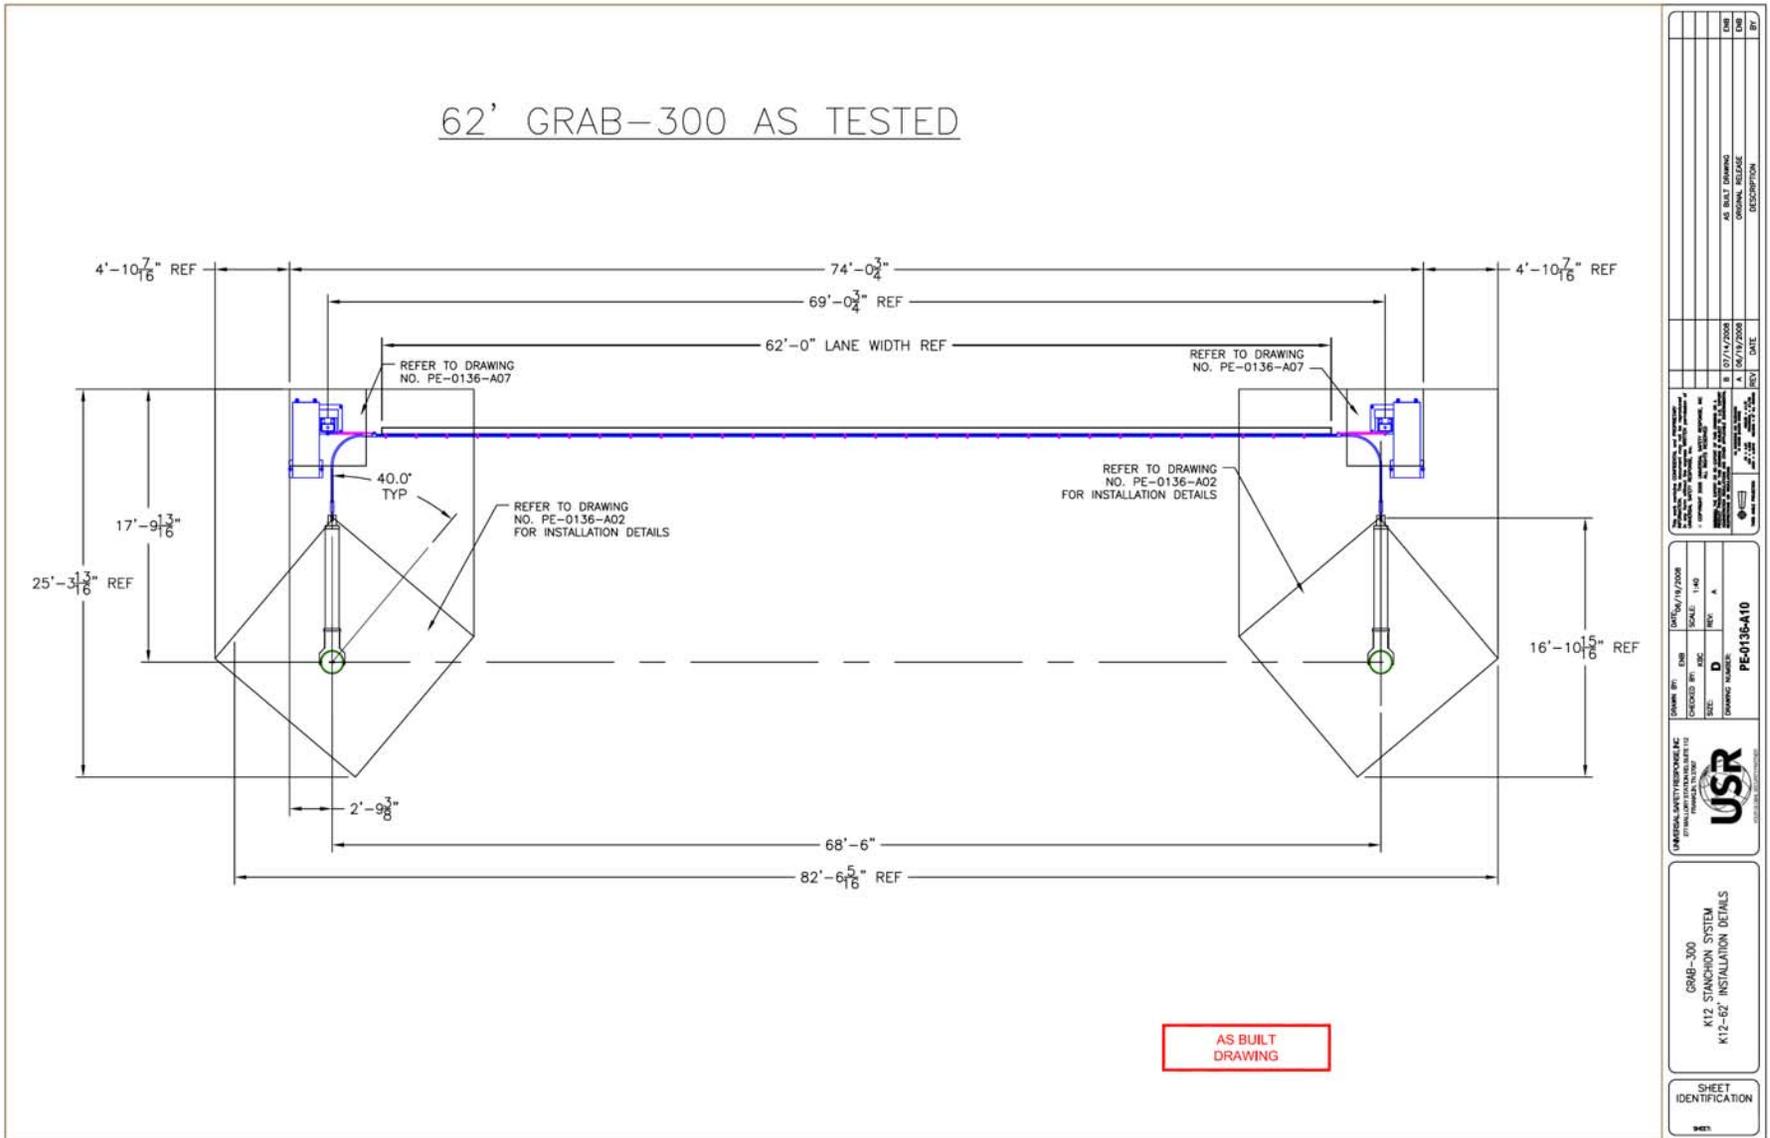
Details of the GRAB-300 62-ft barrier net – stanchion system installation details.
